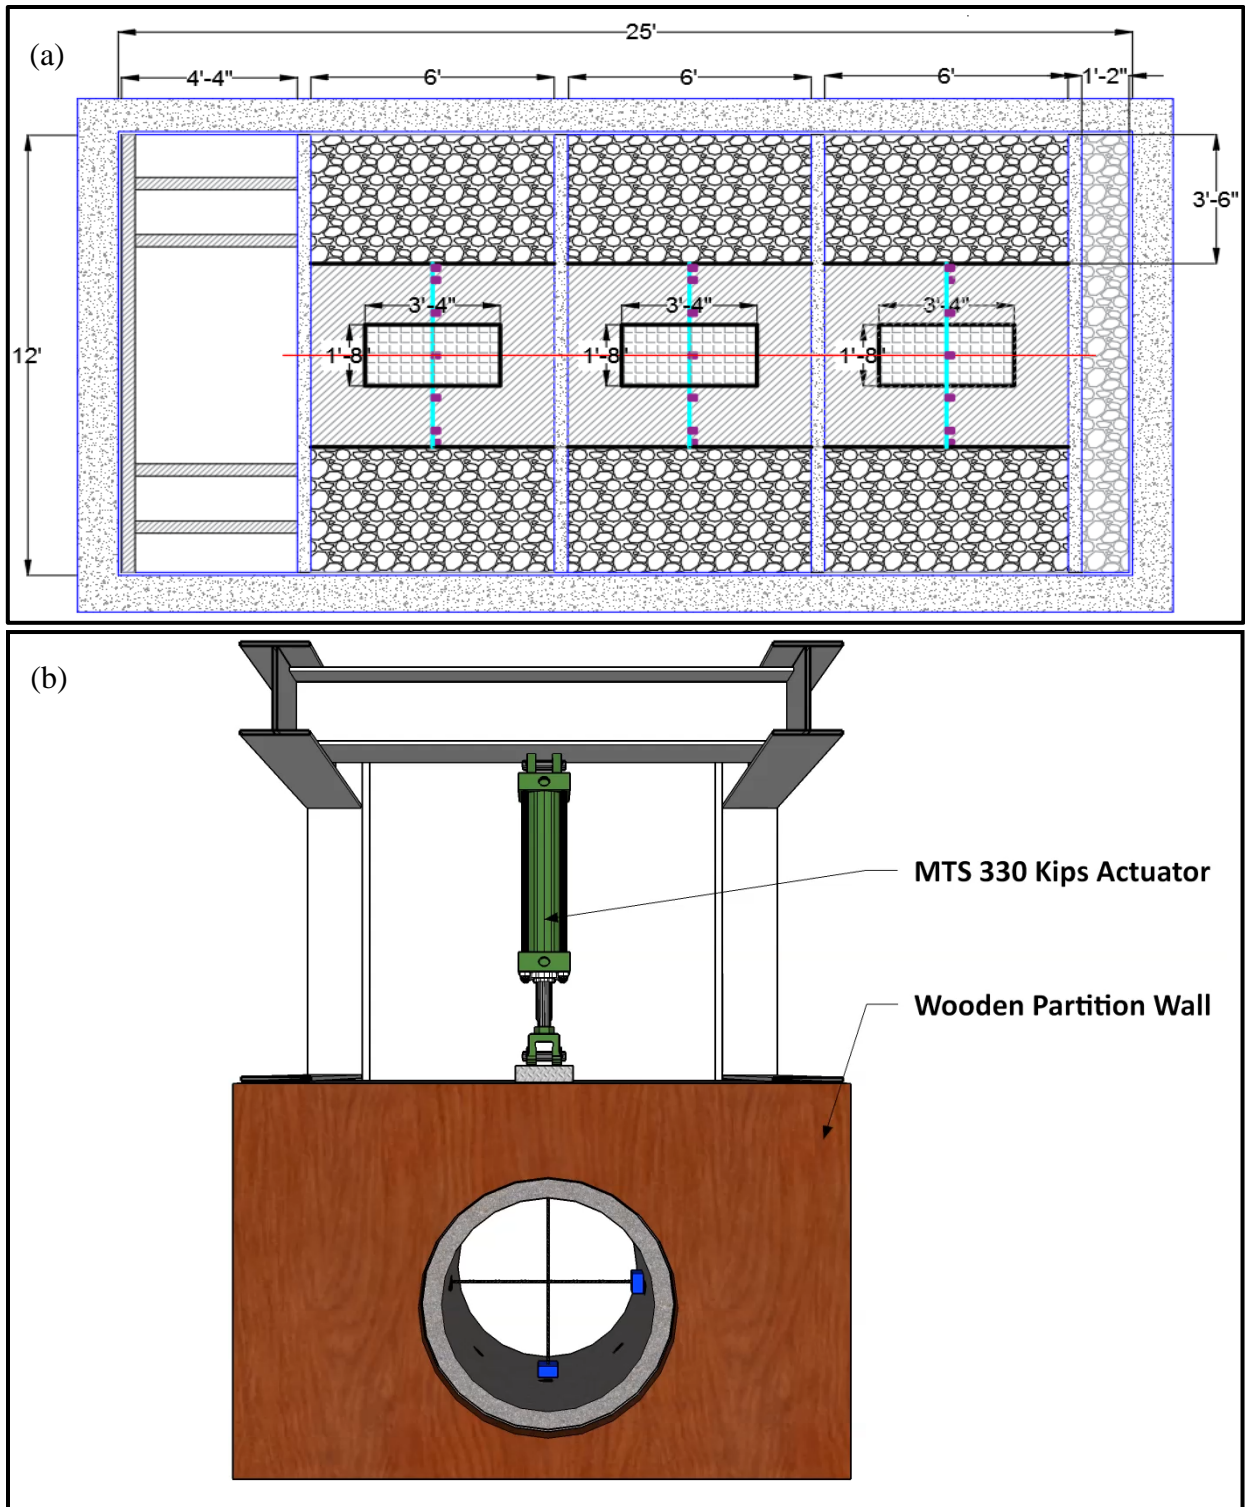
Soil box test configuration: (a) 2D schematic plan view of the soil box layout including partition walls and three testing pipe samples, and (b) 3D schematic cross-sectional view of a pipe sample in one of the soil box cells, separated by wooden partition walls.
